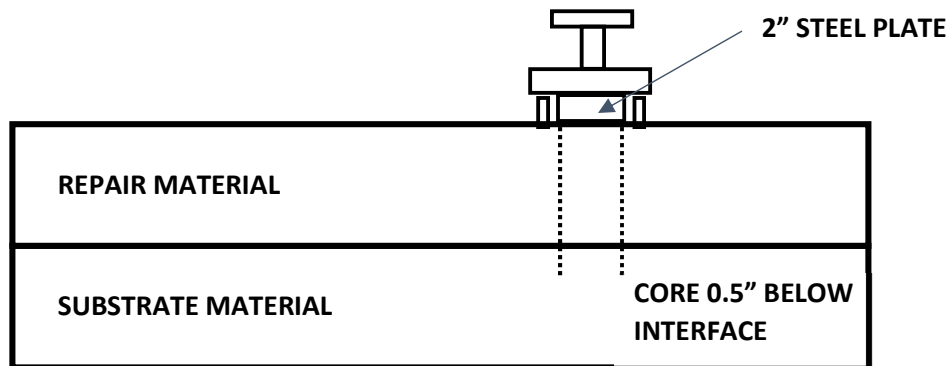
Profile of typical pull-off test setup. *Note.* Drawing not to scale.
